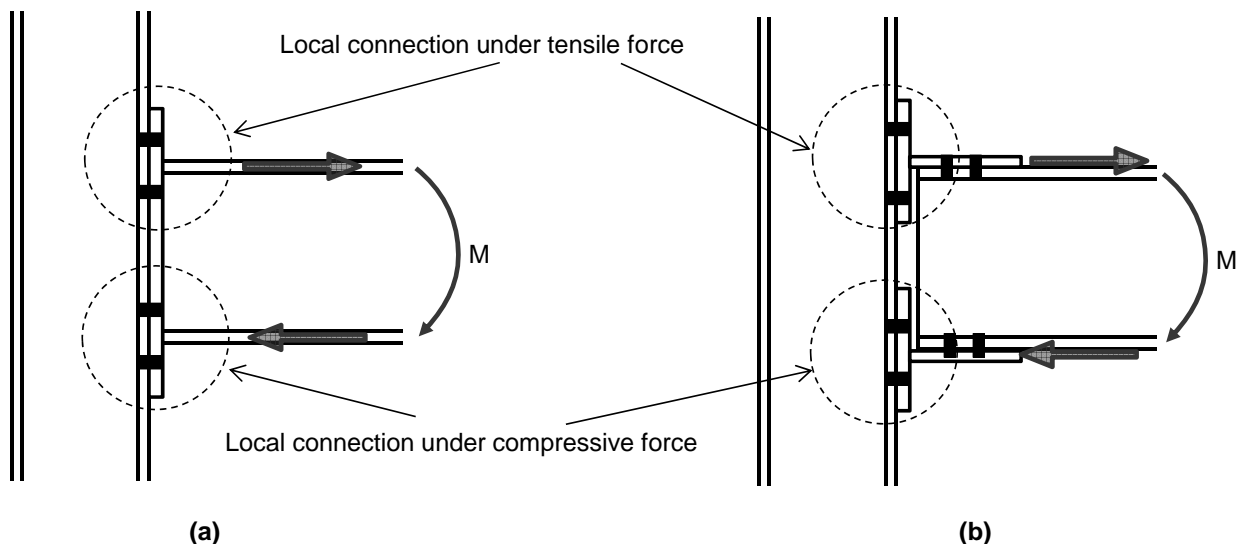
Local connections in bolted beam to column connections: (a) extended end-plate connection; (b) split tee connection.
